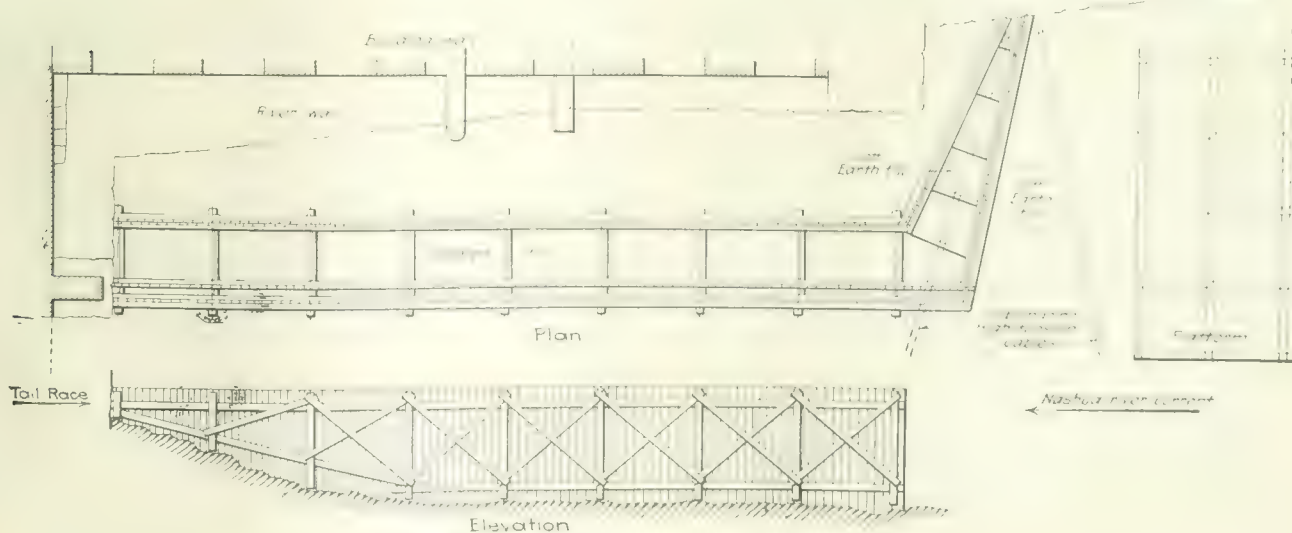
PLAN AND ELEVATION OF COFFERDAM
